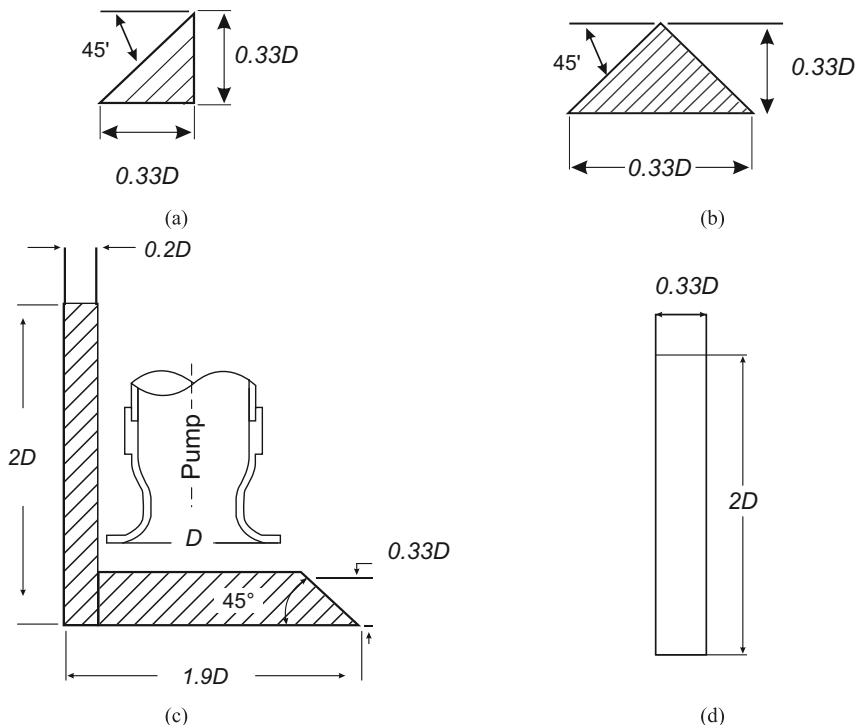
| Recommended dimensions of flow splitters: (a) cross-section of corner splitter; (b) cross section of back wall splitter; (c) elevation of floor and backwall splitters; and (d) front elevation of sidewall and backwall splitters. (Ettema et al., 1998).
